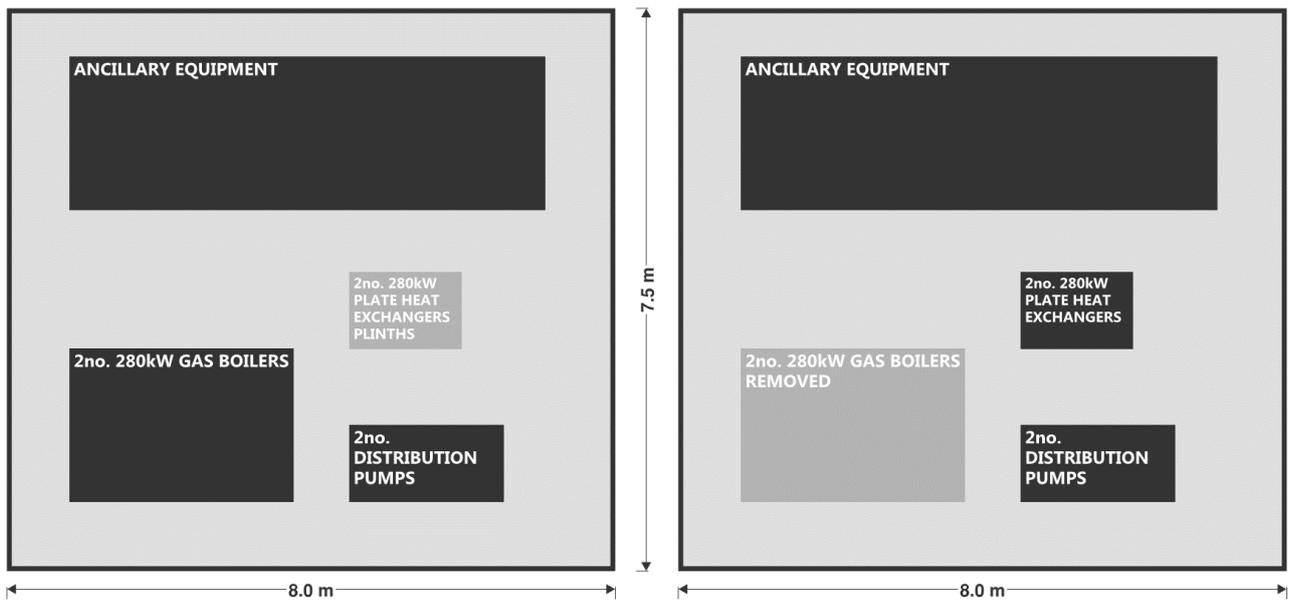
4 Initial future-proofed boiler plant room installation (left) and plant room for district heating connection (right)
